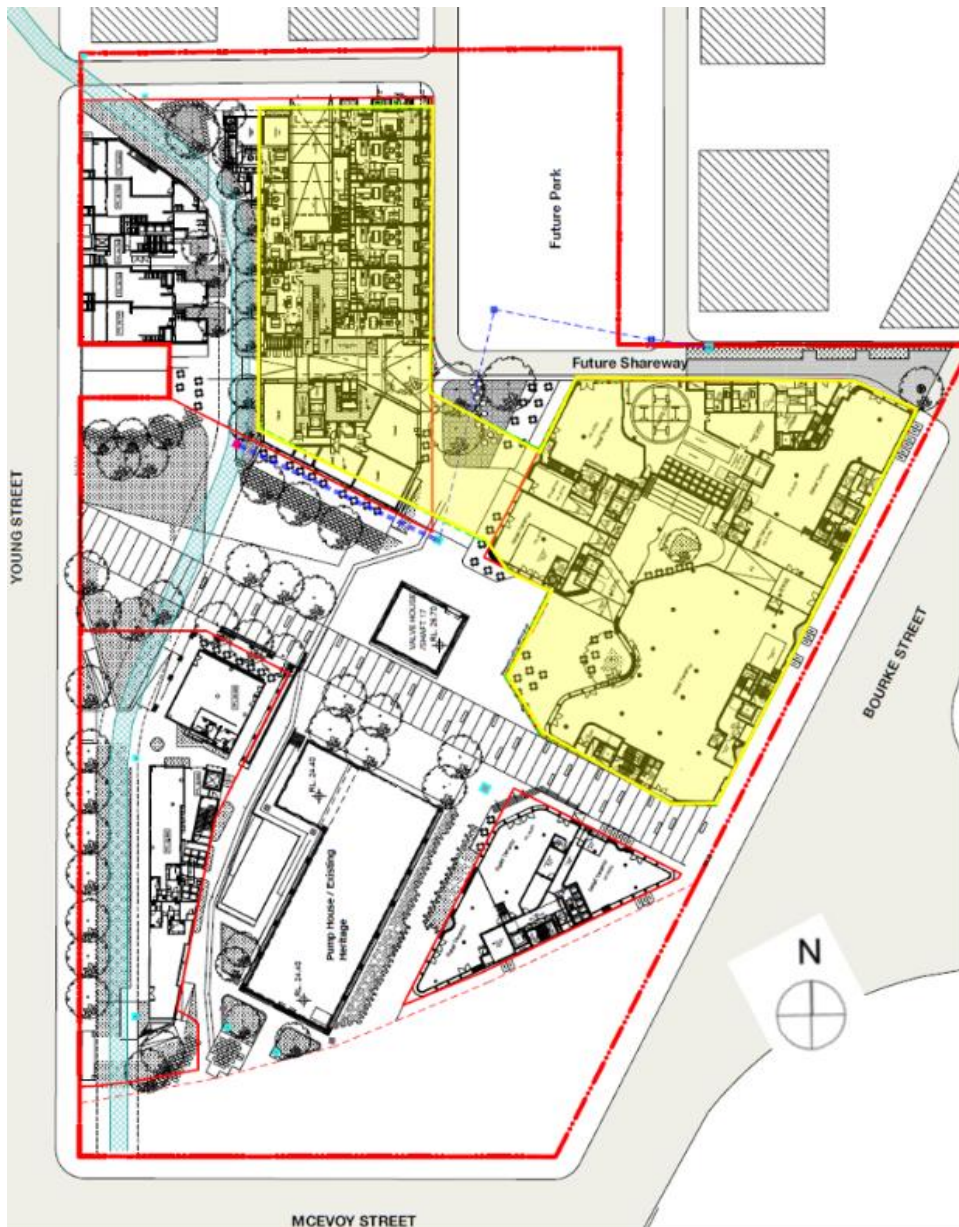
A combined basement is proposed beneath the Tower Building, Bourke Street North Building
